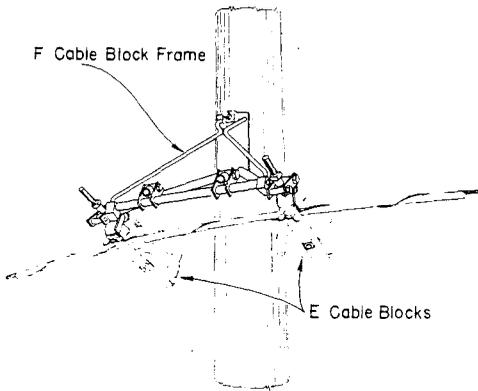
F Cable Block Frame (With Two E Cable Blocks Installed)
